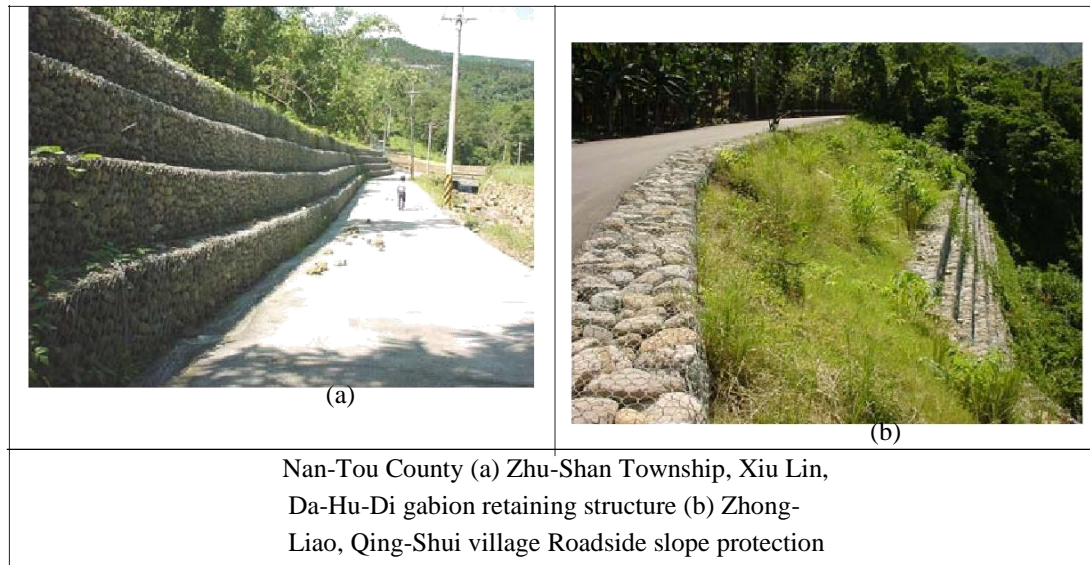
Gabion structures for retaining wall and slope protection in Taiwan
